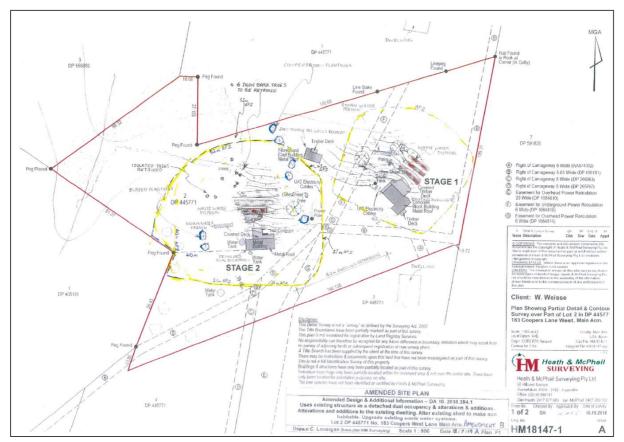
Asset protection zone plan prepared by Chris Lonergan Amendment B, 18/7/2019
